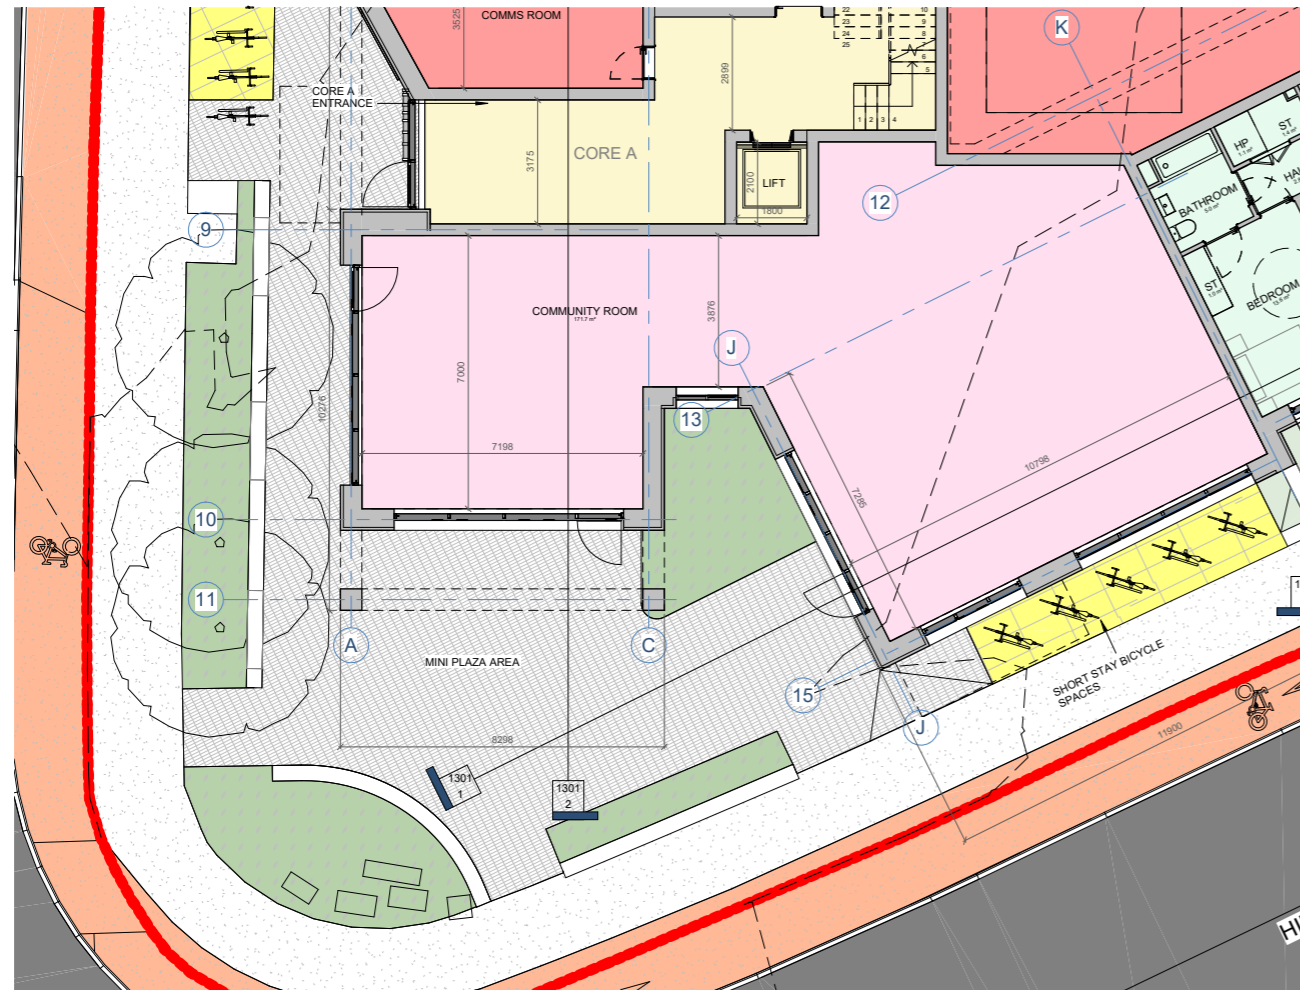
Extract of Ground Floor Plan showing Community Space layout and associated external mini plaza area
